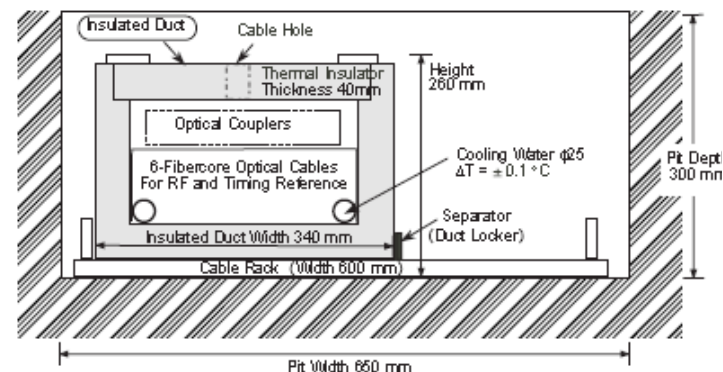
Cross section of the insulated duct set in t under-floor cable trench.
